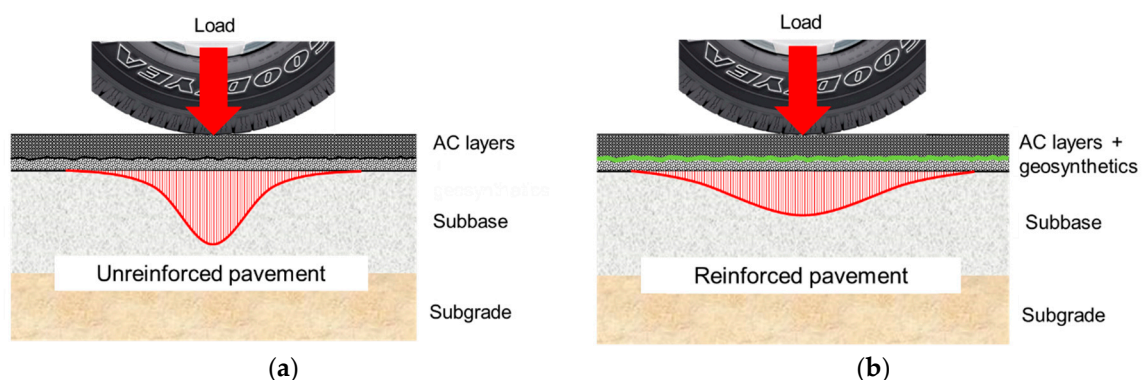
Distribution of vertical stress: (a) unreinforced pavement; (b) reinforced pavement.
